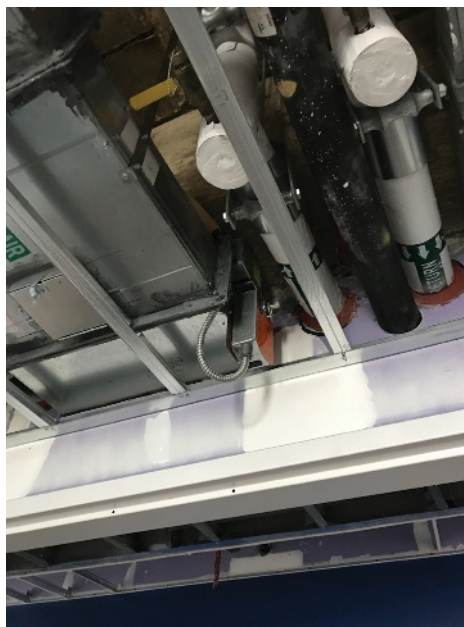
PHOTO A. Smoke damper installed with actuator below the ceiling line. The sleeve was extended and the damper was relocated to clear the ceiling line.
